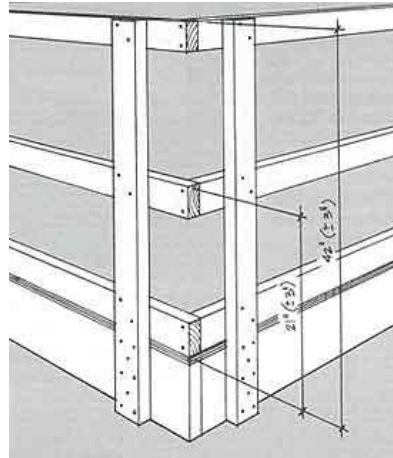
This drawing shows the correct height for guardrails and midrails - about 42 and 21 inches high respectively.
